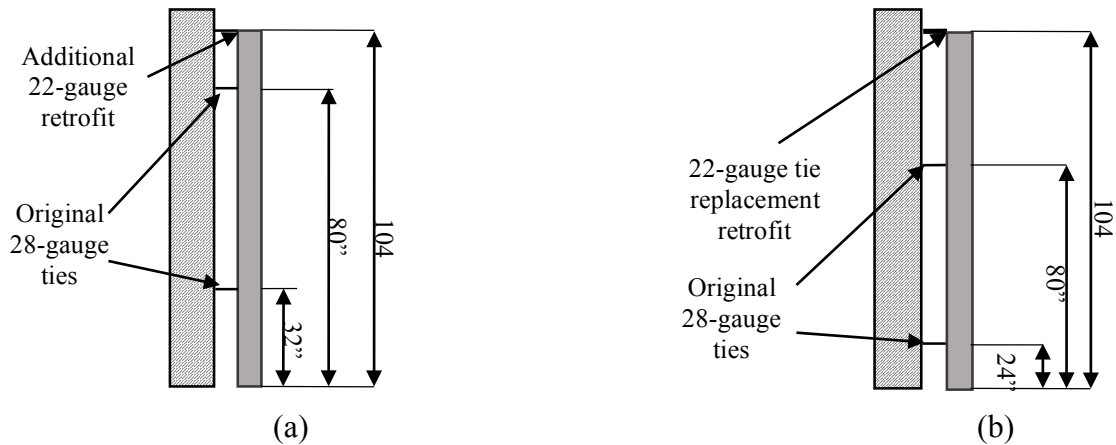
Schematic of retrofits of larger than code-compliant wall models: (a) Wall #5, and (b) Wall #6.
